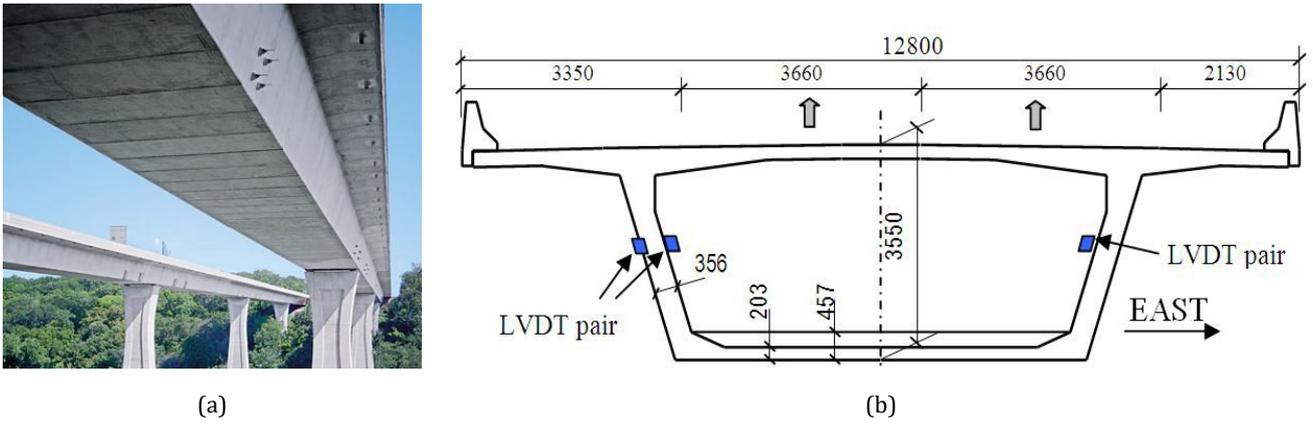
(a) Kishwaukee Bridge, (b) Location of LVDT sensors (unit: mm) [27]
